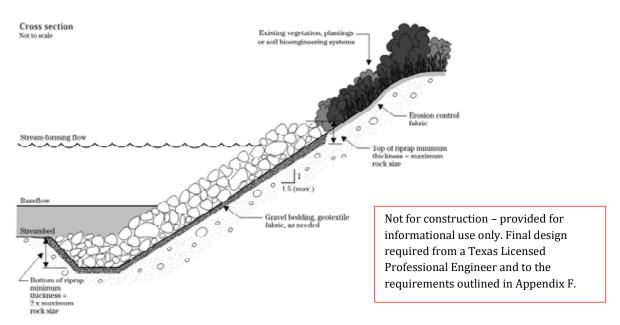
Rock Revetment Example Cross Section (USDA 1996)
